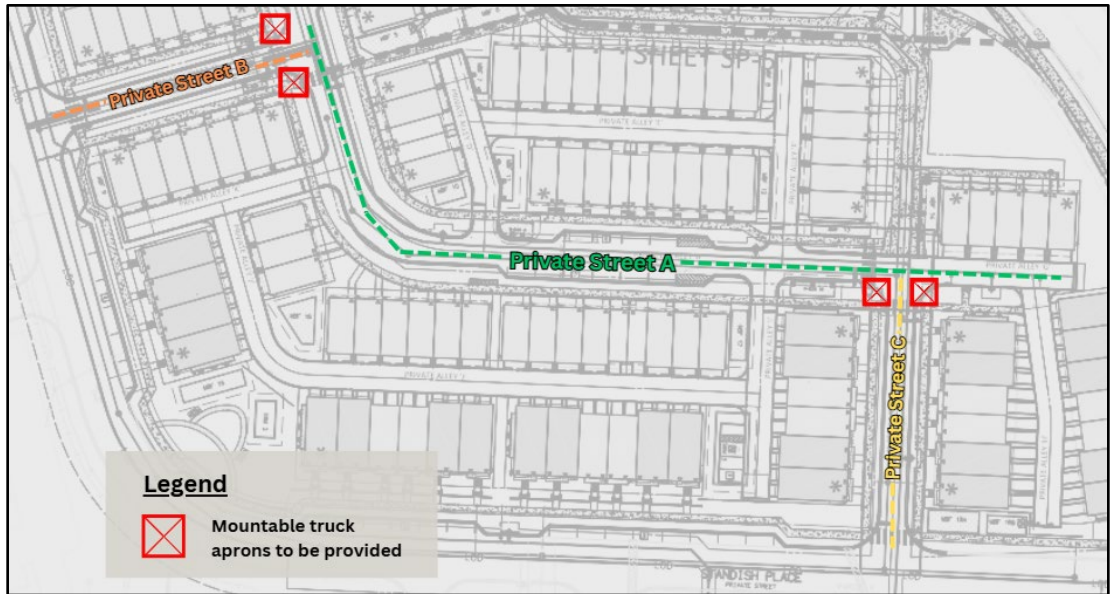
Mountable truck aprons at the intersections of Public Street A with Public Street B and Public Street C, as conditioned.
